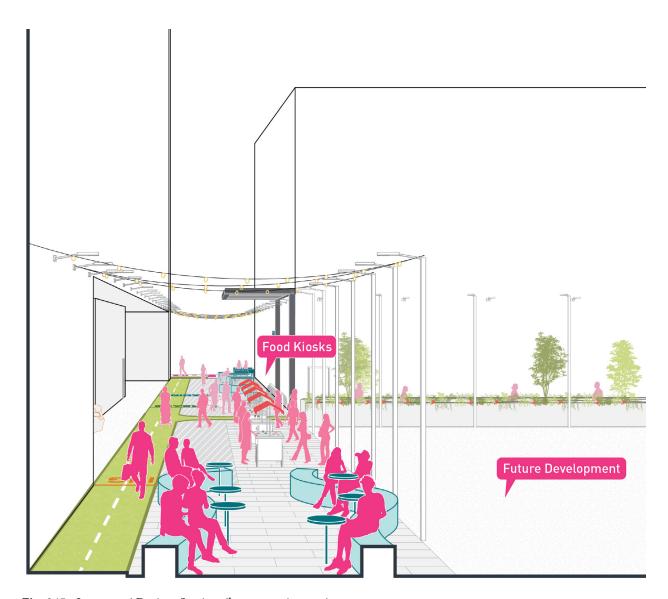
Laneway 6 Design; Section 6b. perspective section
